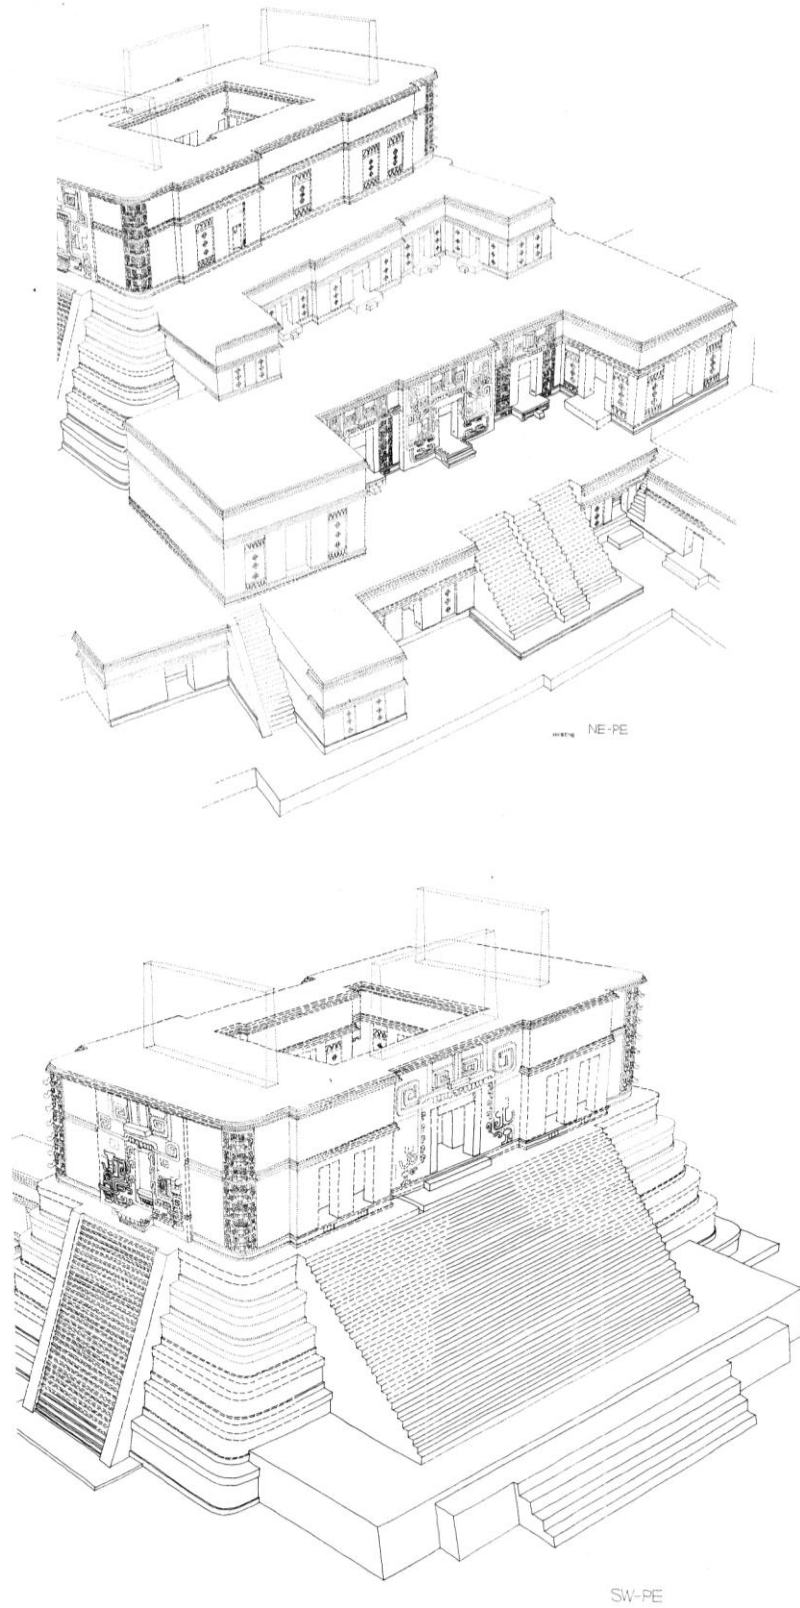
Reconstruction drawings of the north (above) and south (below) facades of Structure IV, Becán (Hohman, 1998)
